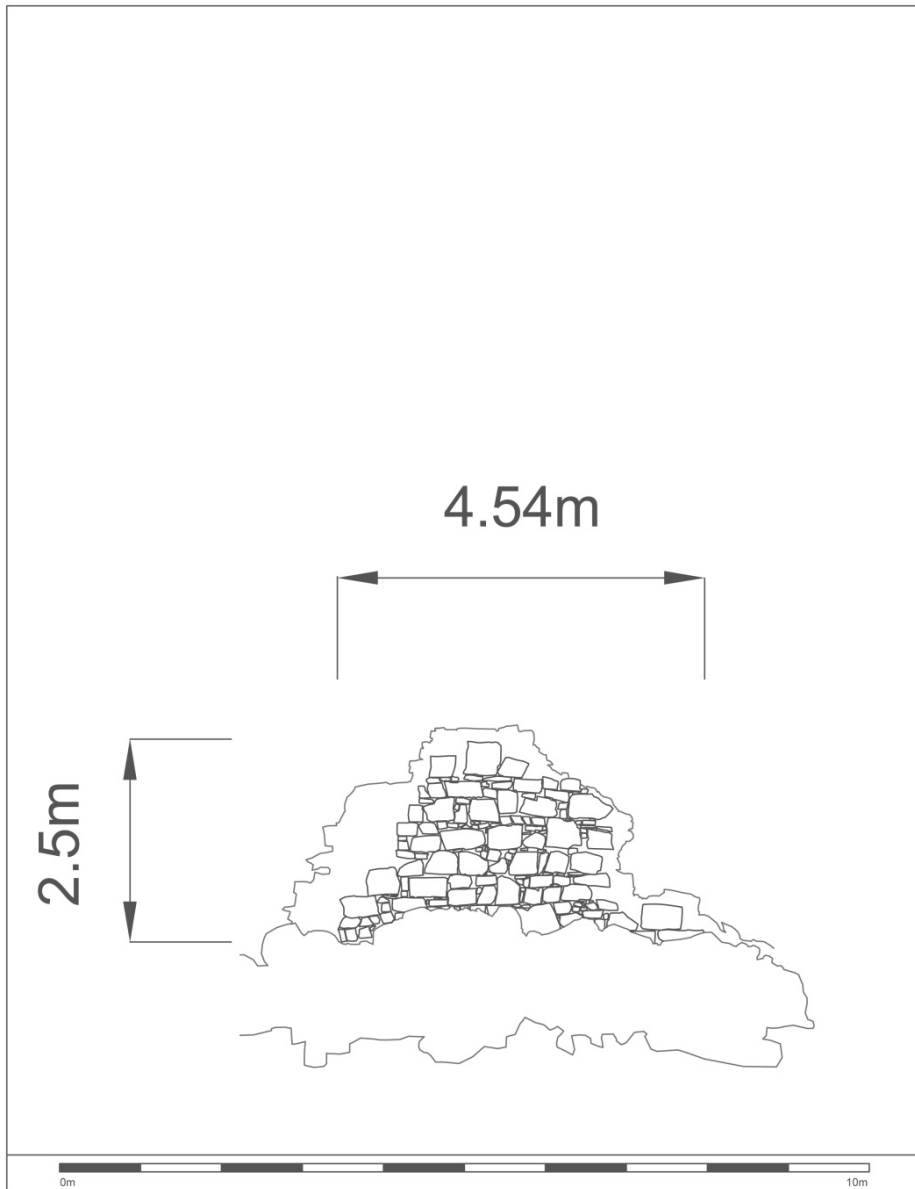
External elevation of the west wall of the collapsed signal tower at Cleggan Hill Signal Station.
